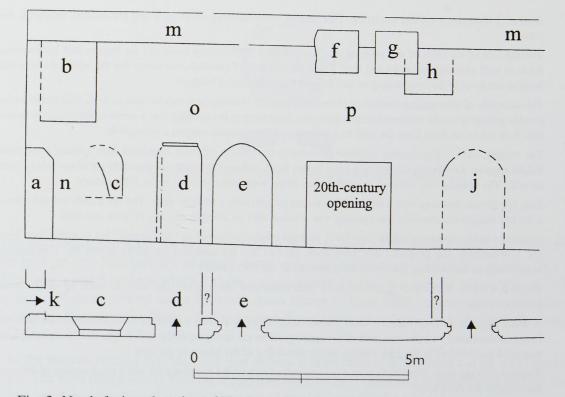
North-facing elevation of No. 72 and conjectural ground floor plan. Scale 1:100
